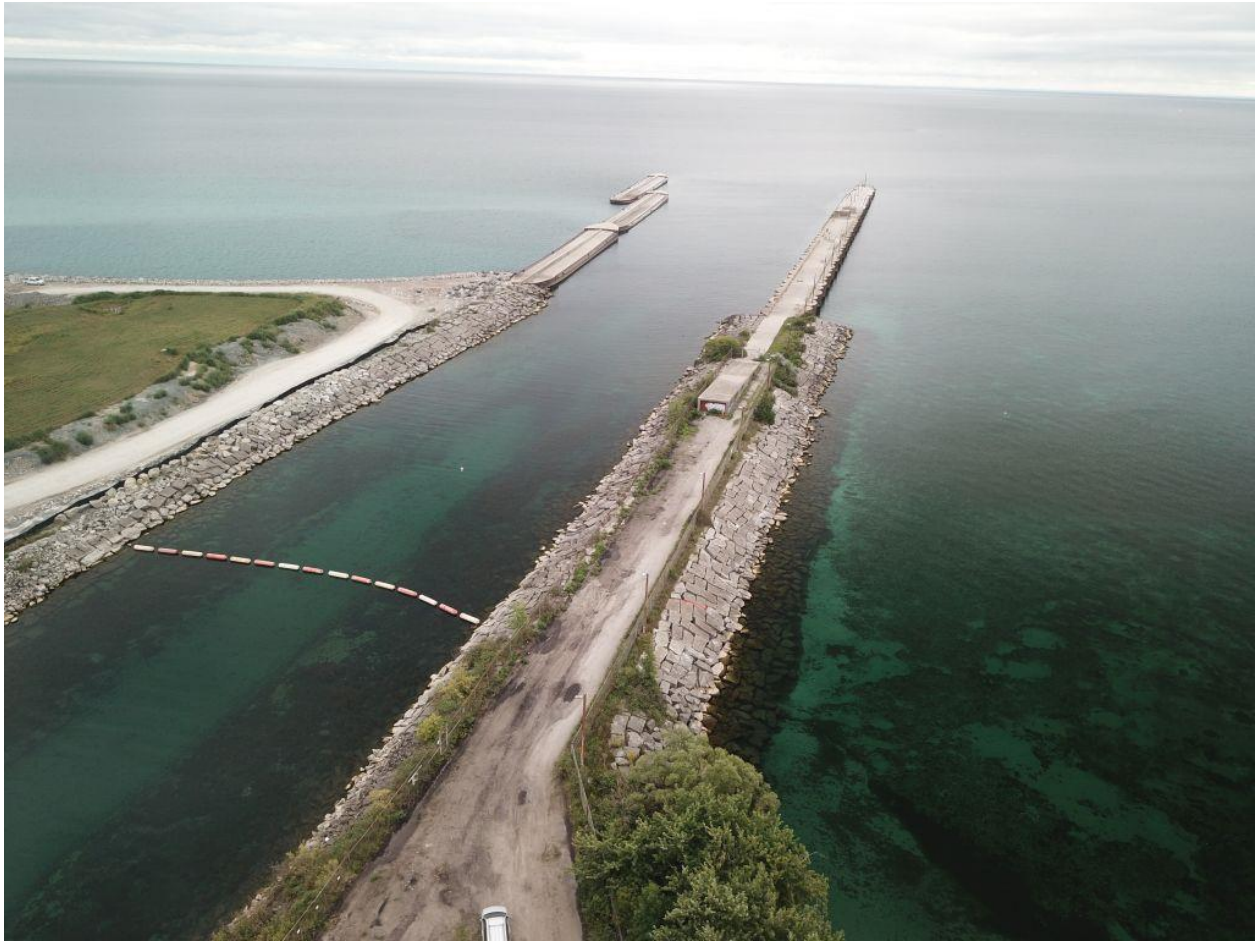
Western Pier (right side of photo; Eastern Pier left side)
